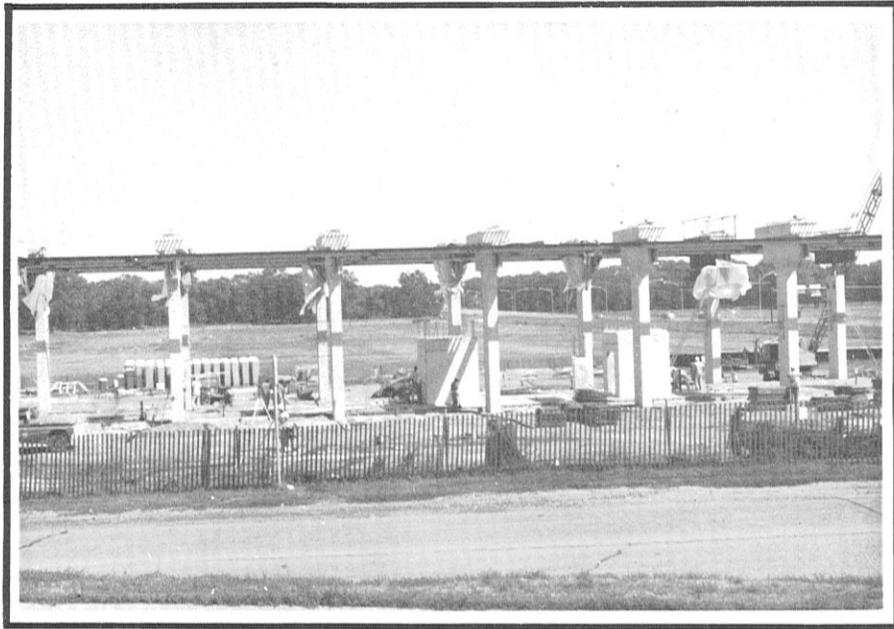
Looking east toward Squaw Creek at construction of a university residential hall. Note: building is designed to withstand flood waters with a minimum amount of damage. It is located near mile 2.35q.
